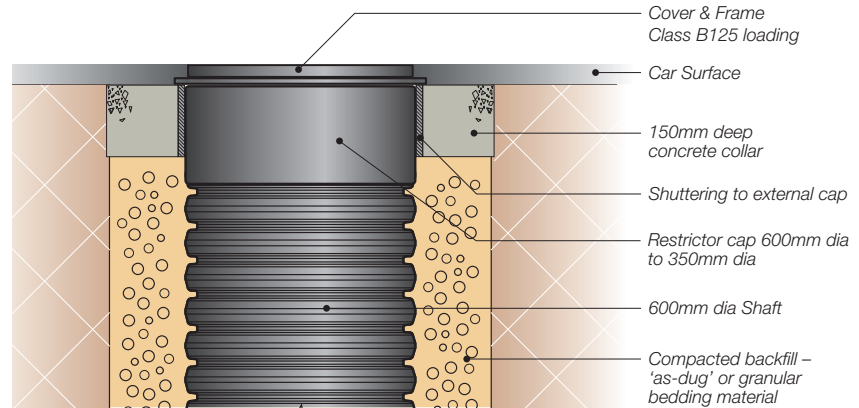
Installation detail for B125 loading: paved areas with limited traffic load
